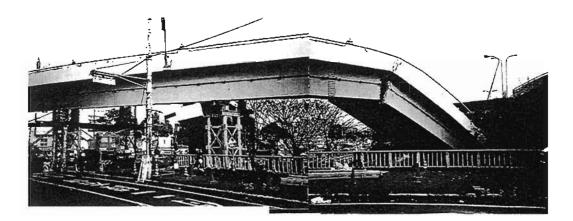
Hanshin Expressway to the west of Kobe centre: Collapse of curved steel box girder ramp due to loss of support at abutment.
